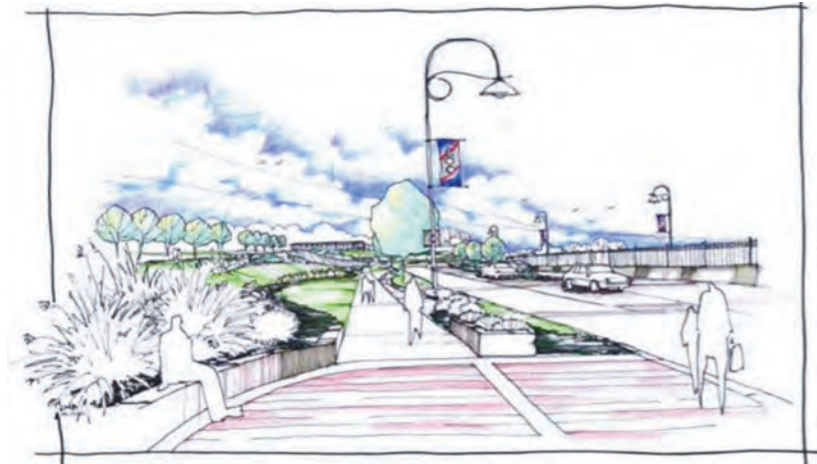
Potential State Street intersection improvements Waterfront Master Plan
